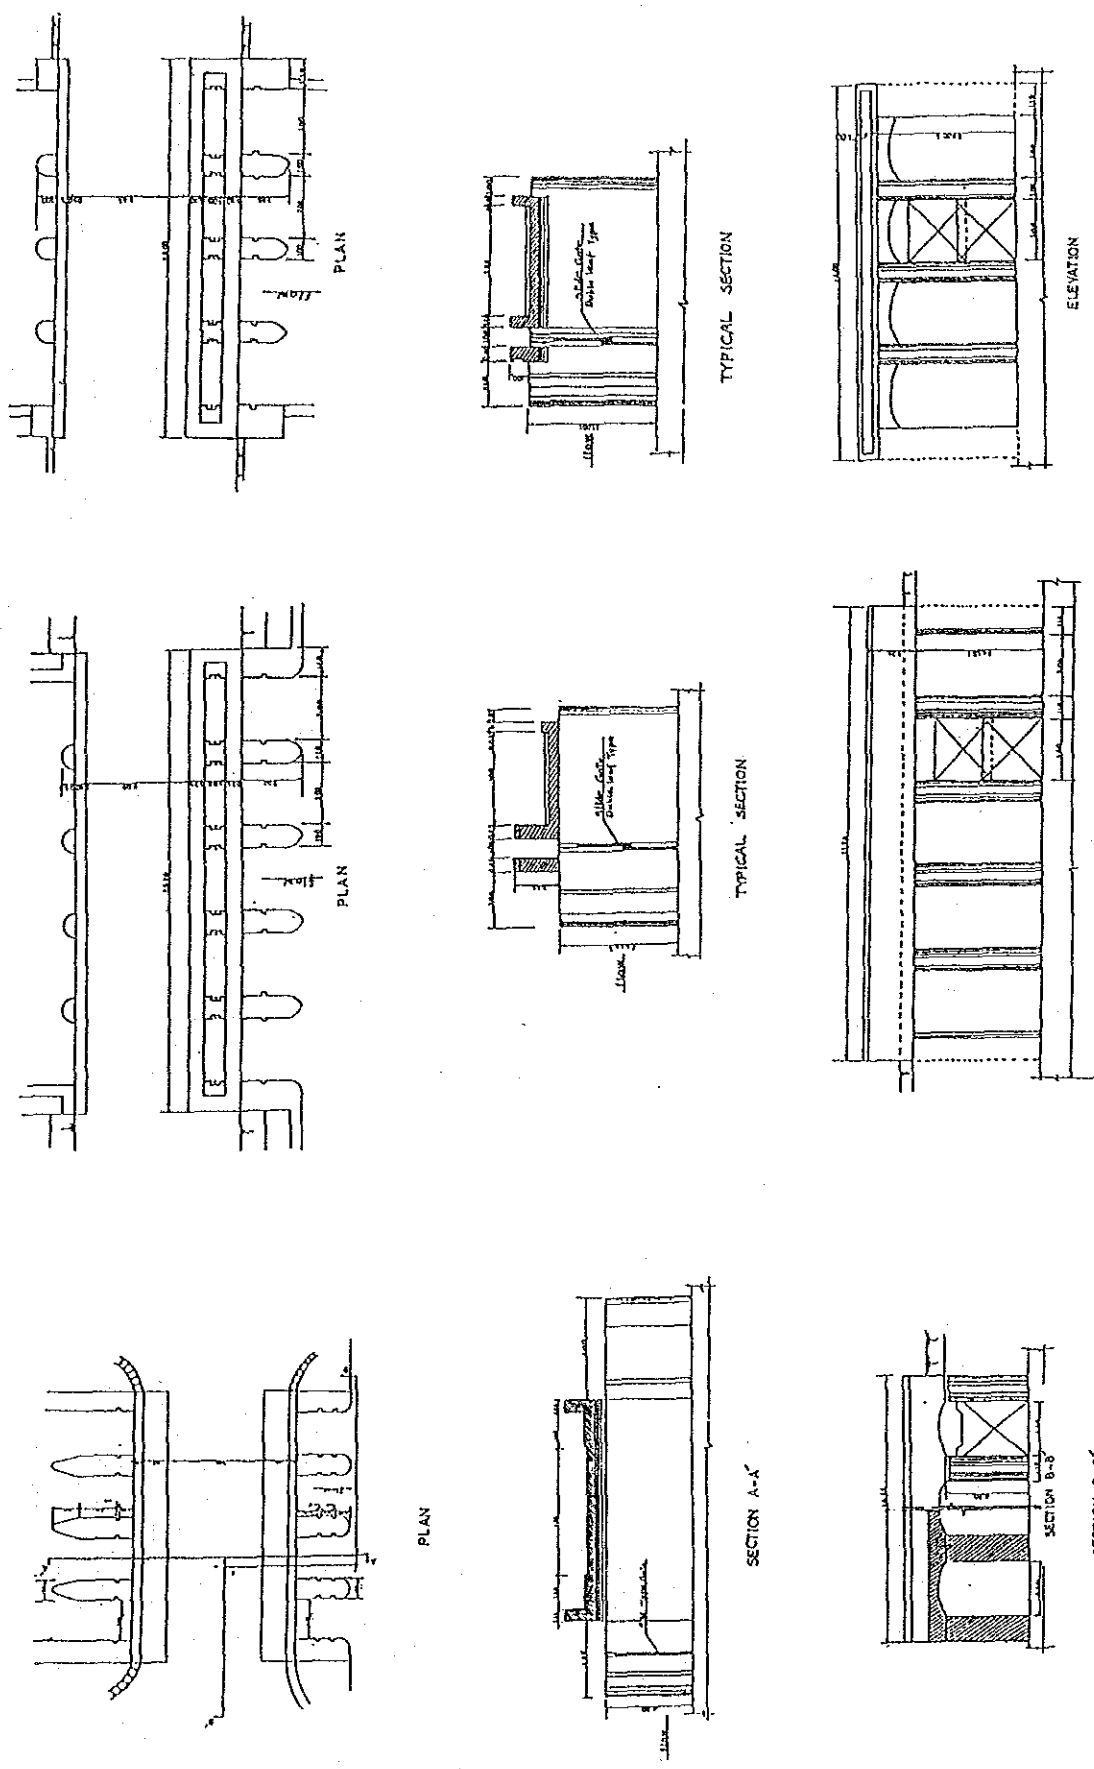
General Plan of Existing Intake and Regulator on Haika Branch Canal
